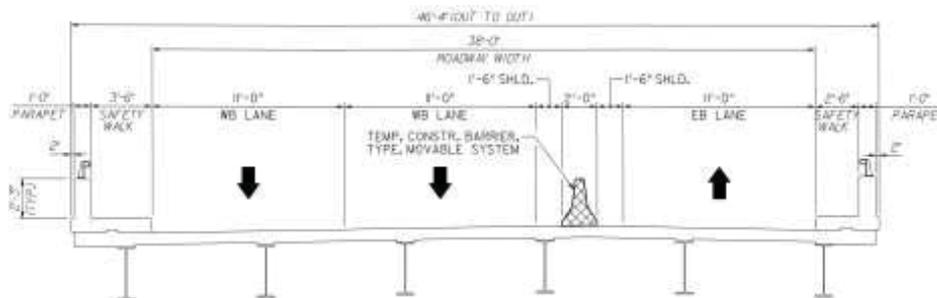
Temporary traffic configuration on Tunney Bridge during Mathis Bridge work/closure
